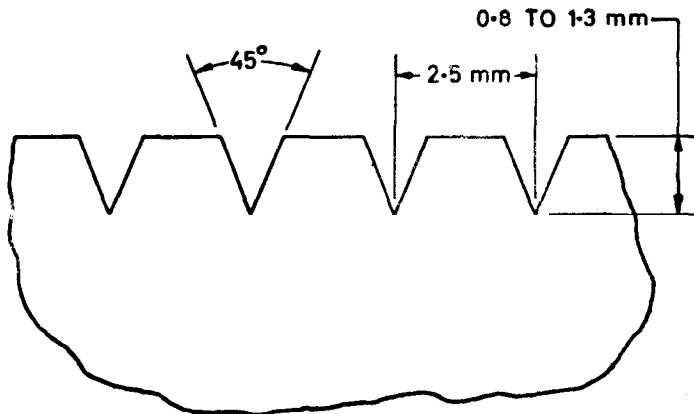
DETAILS OF A TYPICAL NOTCHED TROWEL
